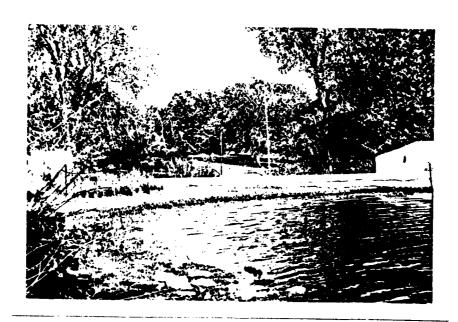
Picture of entrance to spillway taken from left abutment of dam.
